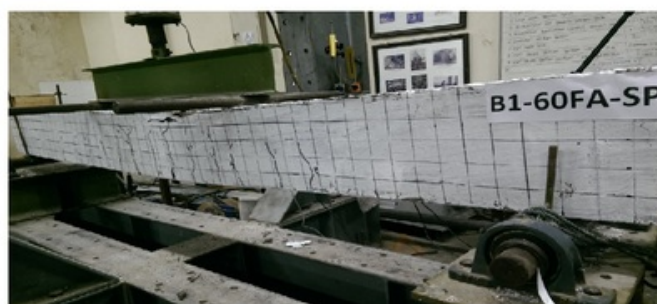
The crack pattern of B1-60FA-SP specimen.
